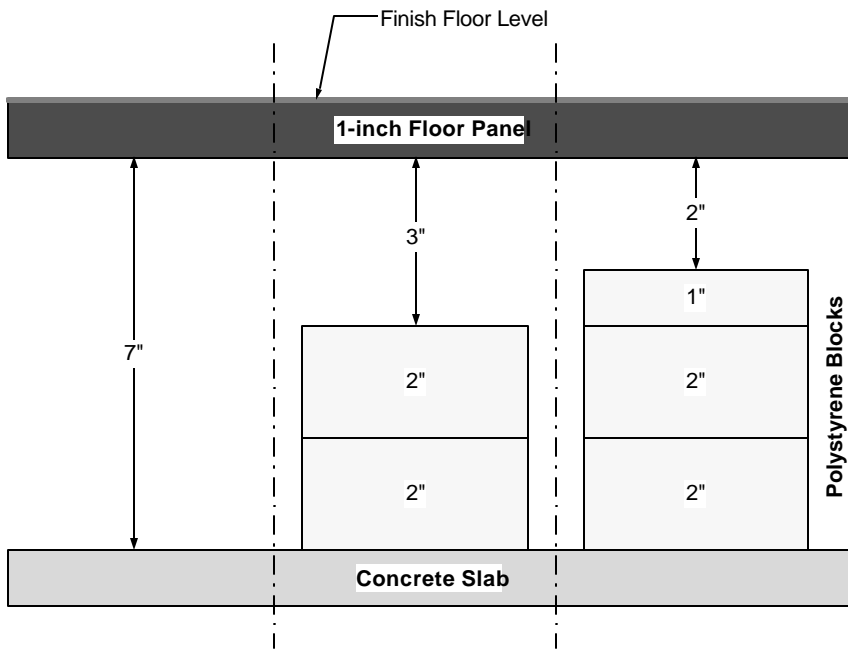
Schematic cross section of CBE Underfloor Air Supply Plenum Test Facility
